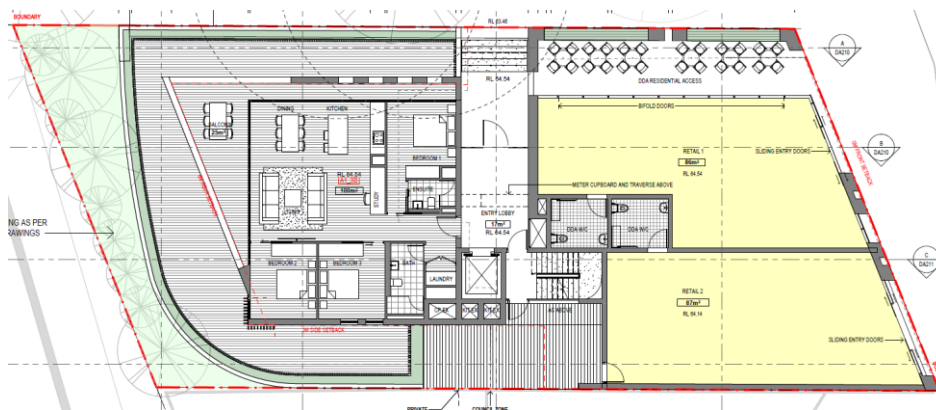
Originally proposed level 1 floor plan under the subject DA - 18-20A Perouse Road, Randwick (Source: Curzon & Partners)
